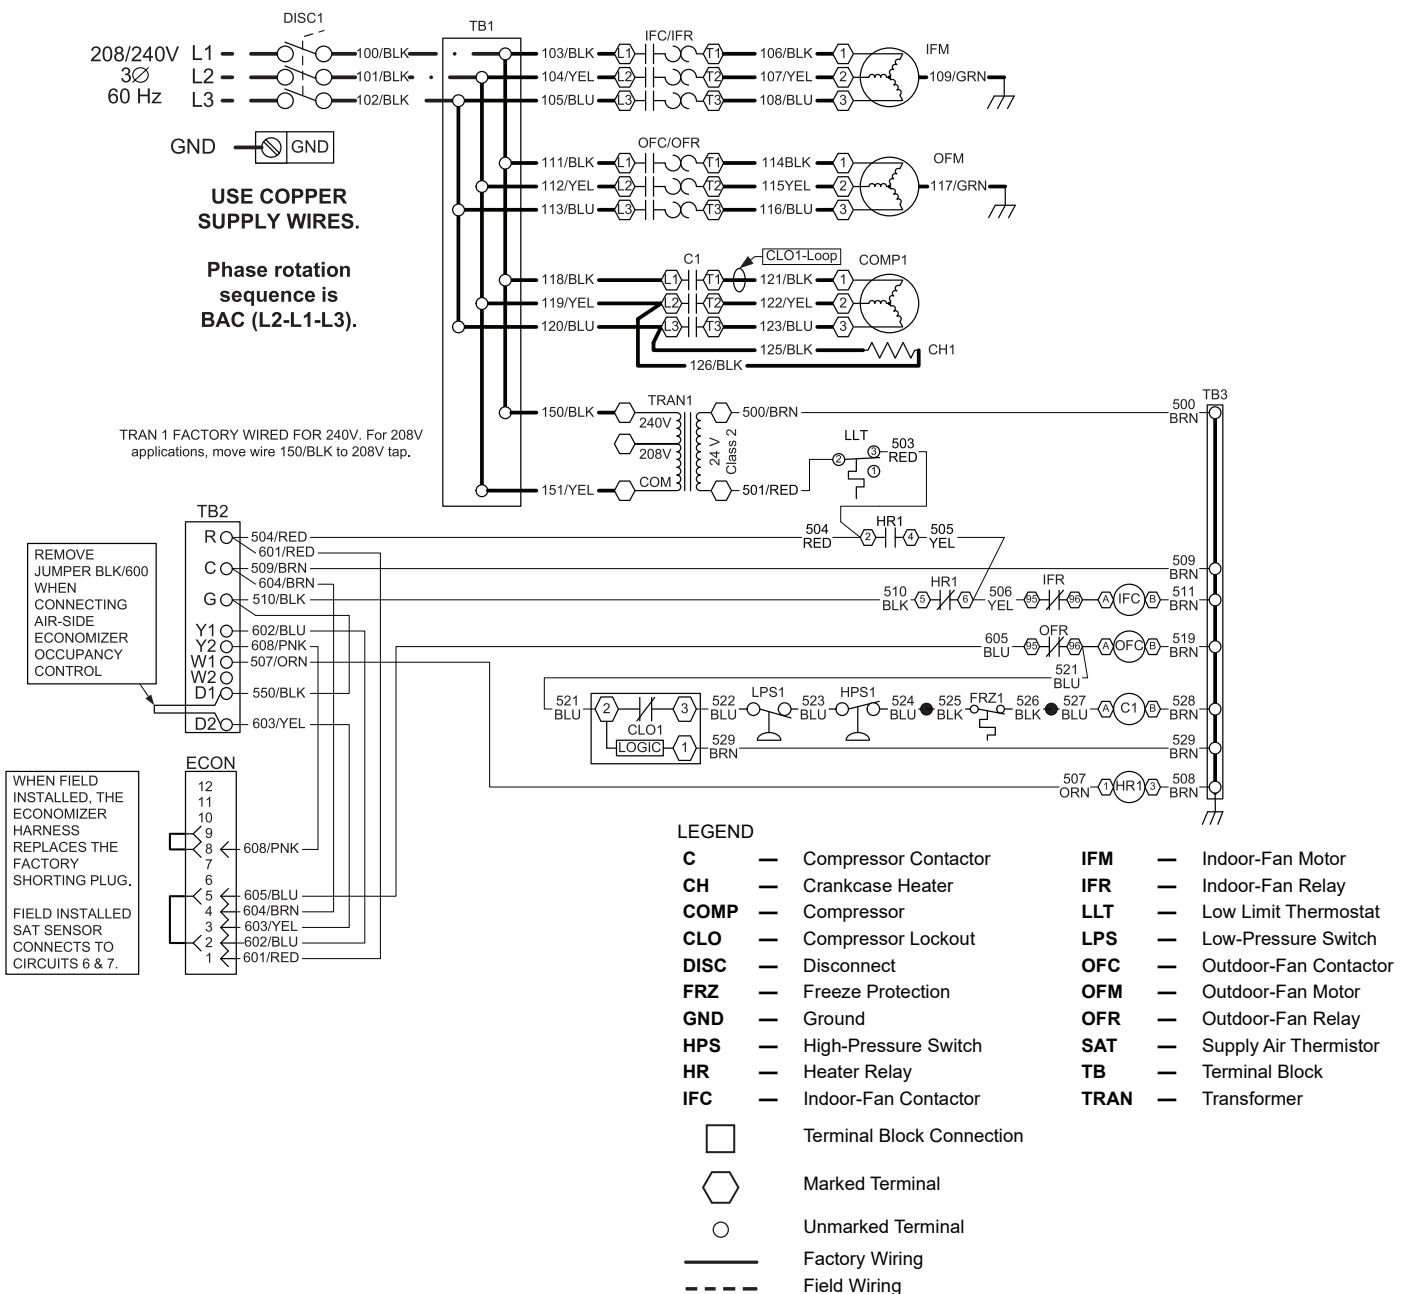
Typical Heating Coil Control Wiring (ON/OFF)
